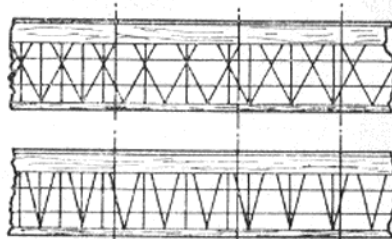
GEODETIC & WARREN GIRDER CONSTRUCTIONS.
